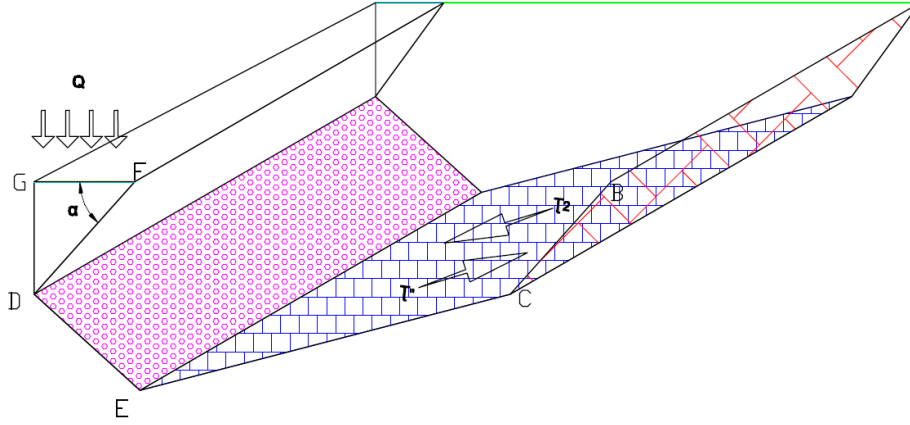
3D shape of failure surfaces (A4 surface is purple, A5 surface is blue, A6 surface is red).
